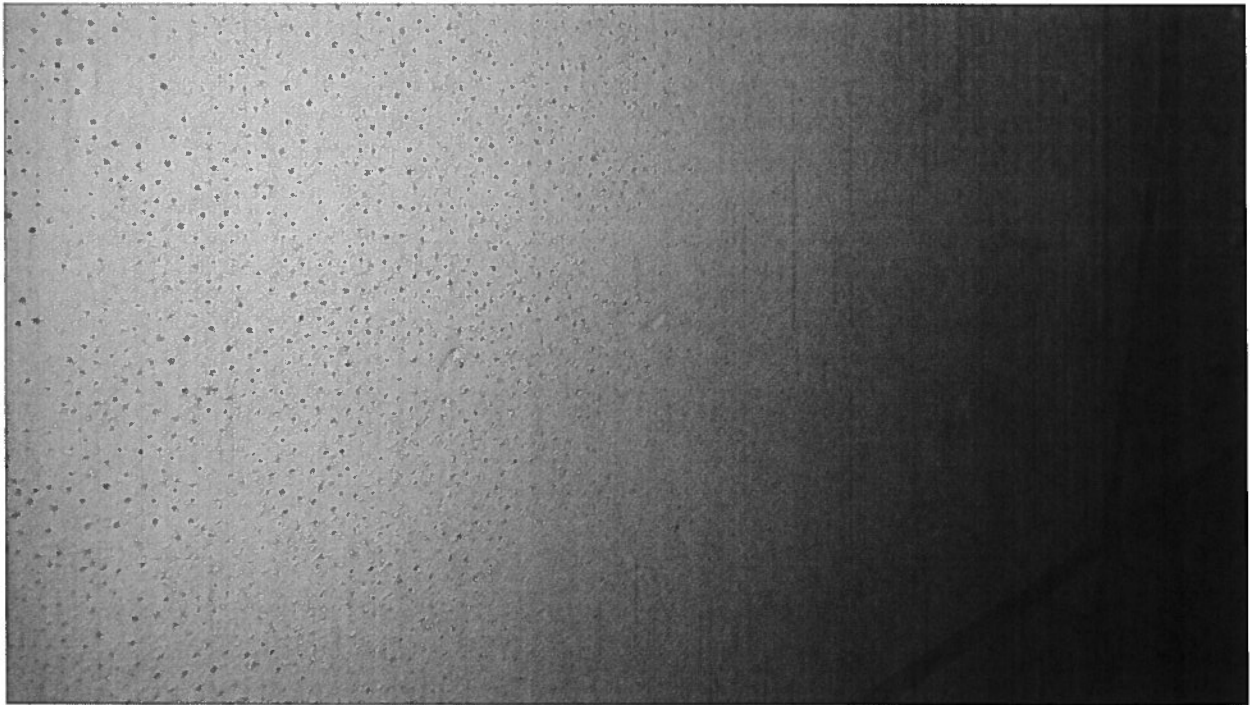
Asbestos Containing Pink Back Acoustic Ceiling Tile
